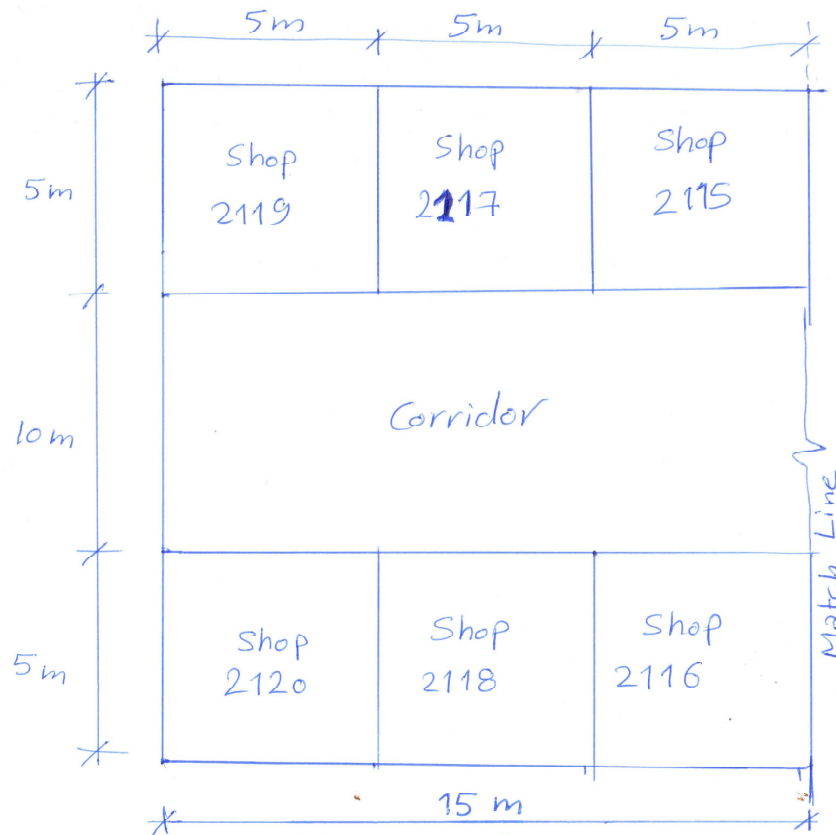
Most Remote Zone of Second Floor (Typical Floor) for Six Shops and the service corridor, in New Cairo Mall Building (starting from Ground floor up to 2nd Floor) (Item c)
